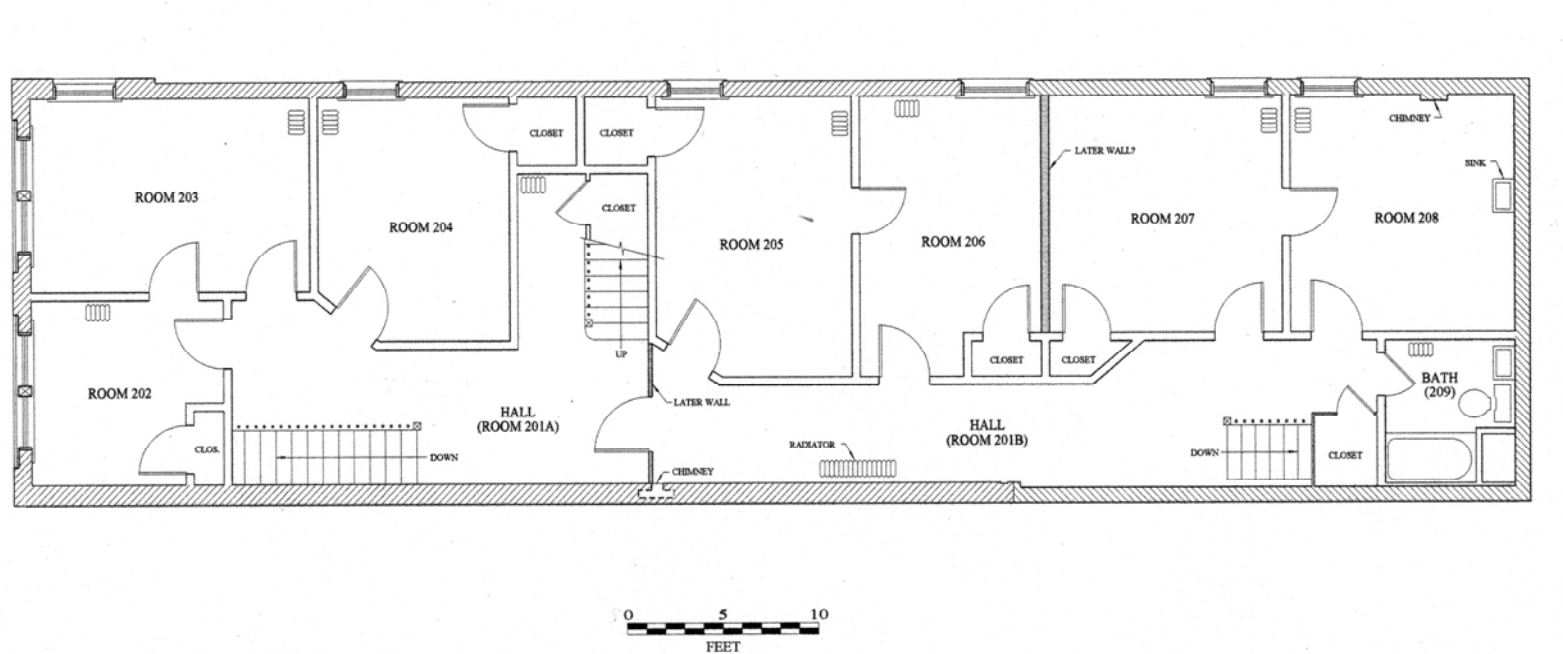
Second floor plan of the Coney Island Building, showing conditions in 2000.
